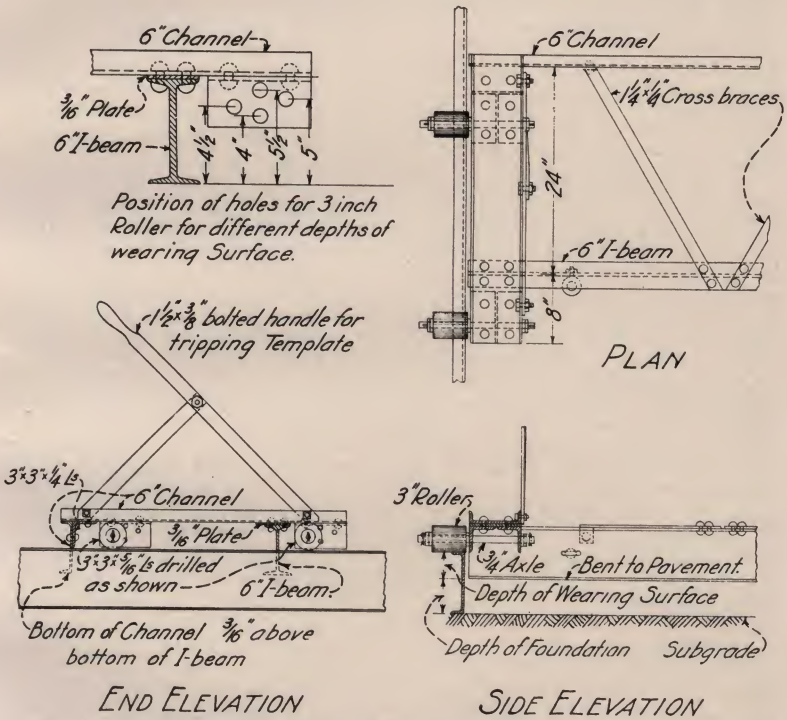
Construction of Double Templet Recommended for Building Monolithic Brick Pavements.
